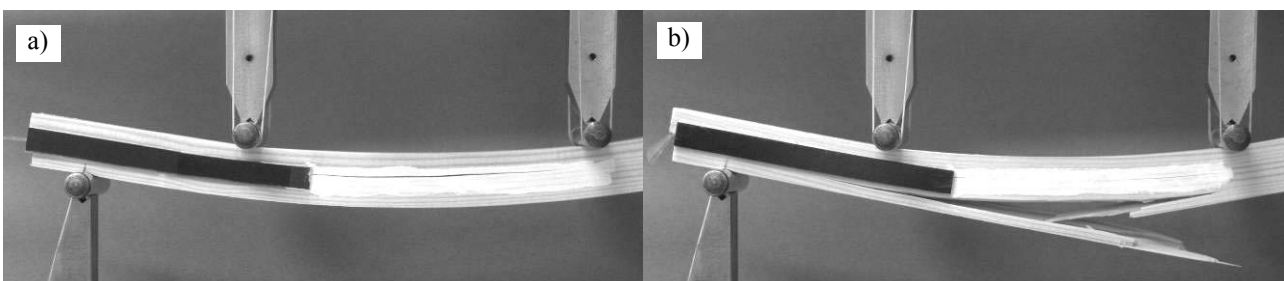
Crack propagation at the horizontal shear crack tip (a) and cross-graining between the loading cylinders (b) for a $L_p=105$ mm repair.
